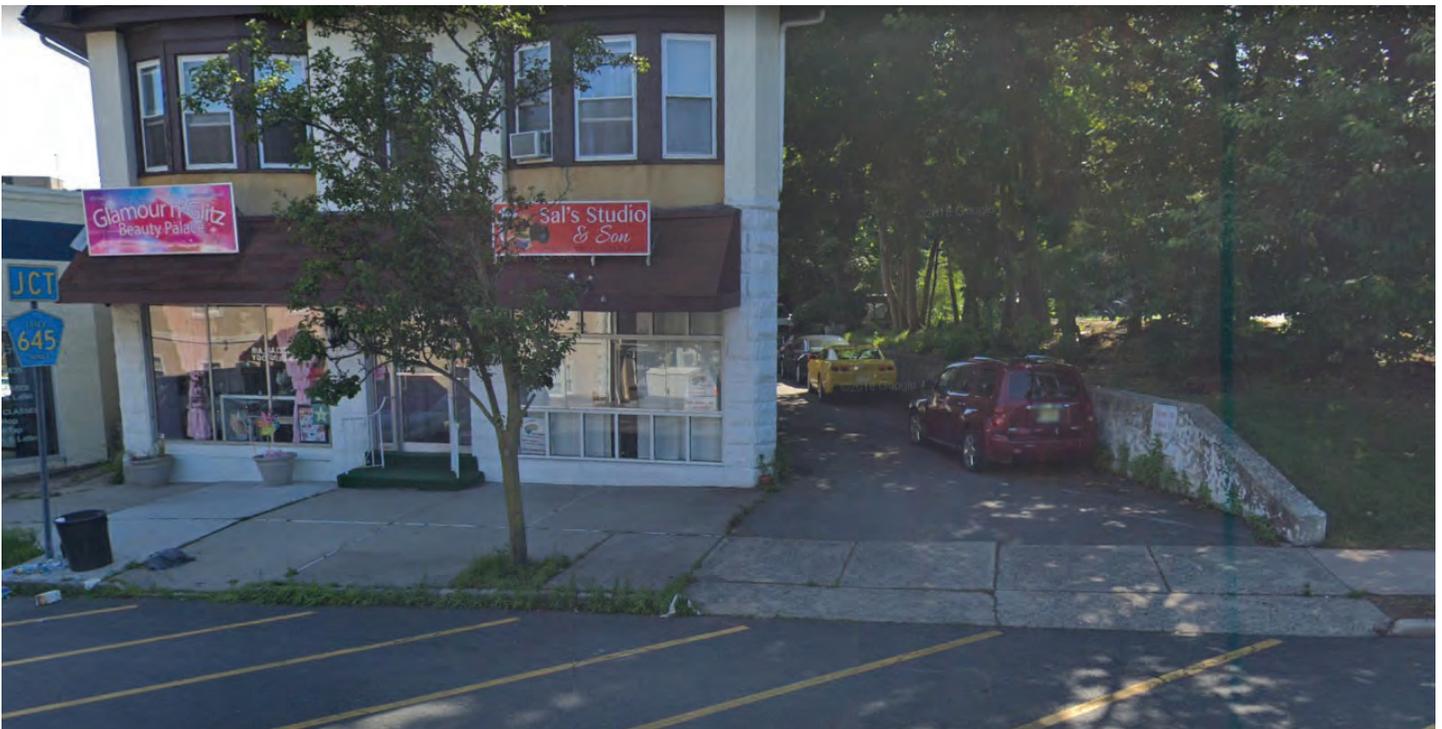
West Plaza entrance depicting no site lighting, vehicles parked along the retaining wall and no pedestrian walkways or safety measures. Image obtained from Google Streetview and dated June 2018.
